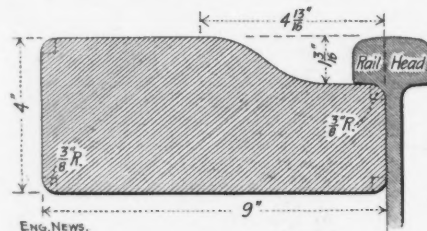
Special Brick for Use on the Gage Side of Street Railway Rails.
